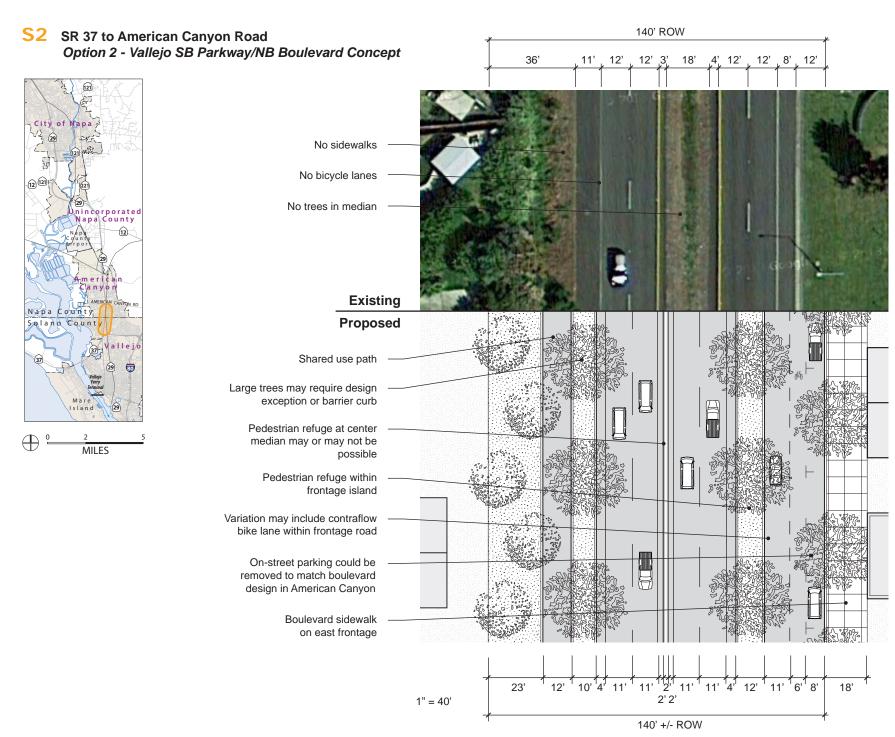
Existing and Proposed Conditions - Section 2 Parkway Concept
